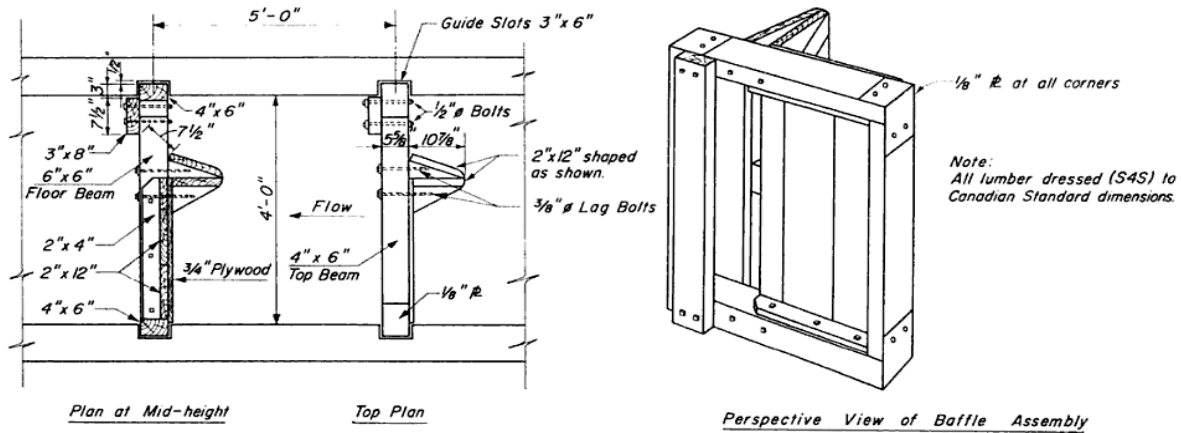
Baffle plan of small fishway for trout using a single vertical slot. This design uses a timber baffle and concrete fishway walls.
